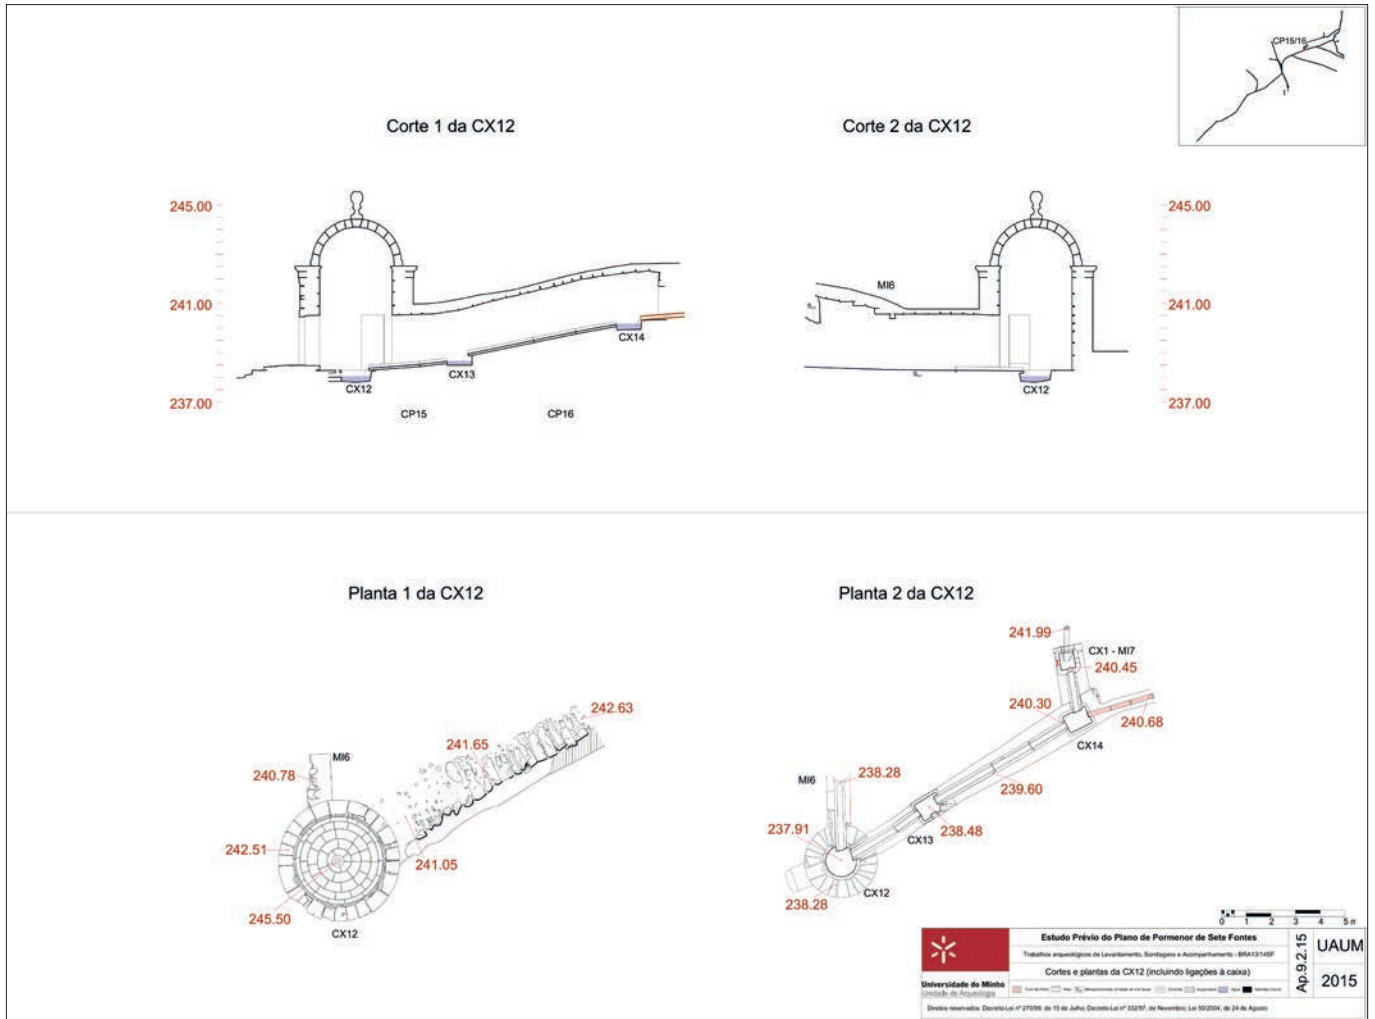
Elevations and plans of Dr. Sampaio's settling basin (CX 12). © UAUM
